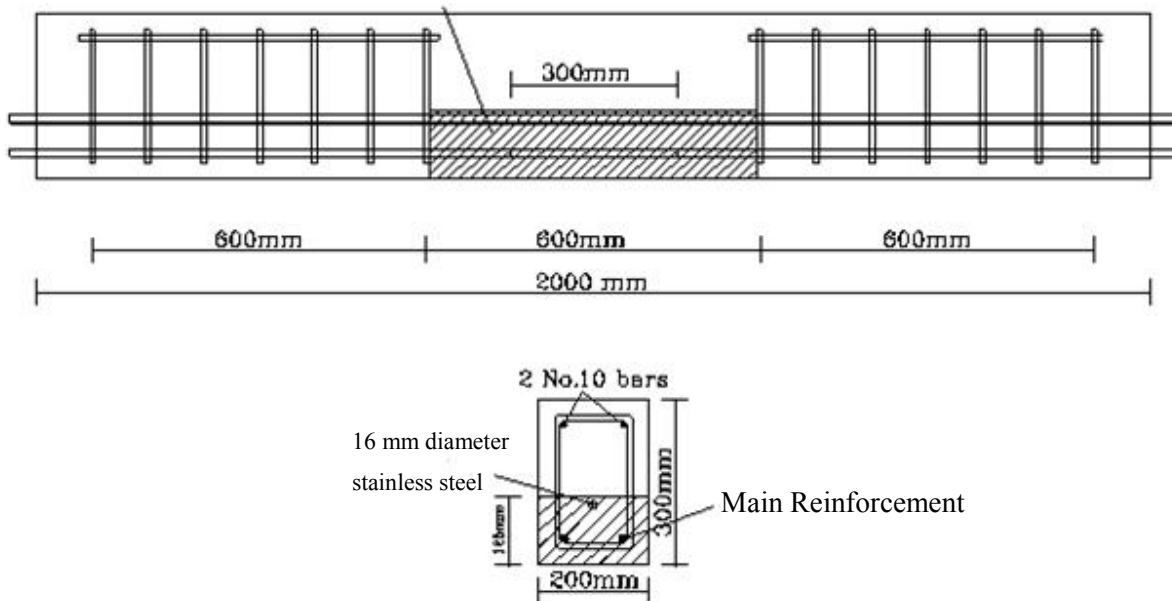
Location of the salted concrete within the lap splice region in the test specimen
